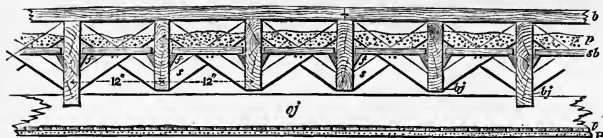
Section of Single Floor, showing Pugging, Sound-Boarding, and Herring-bone Struts.
